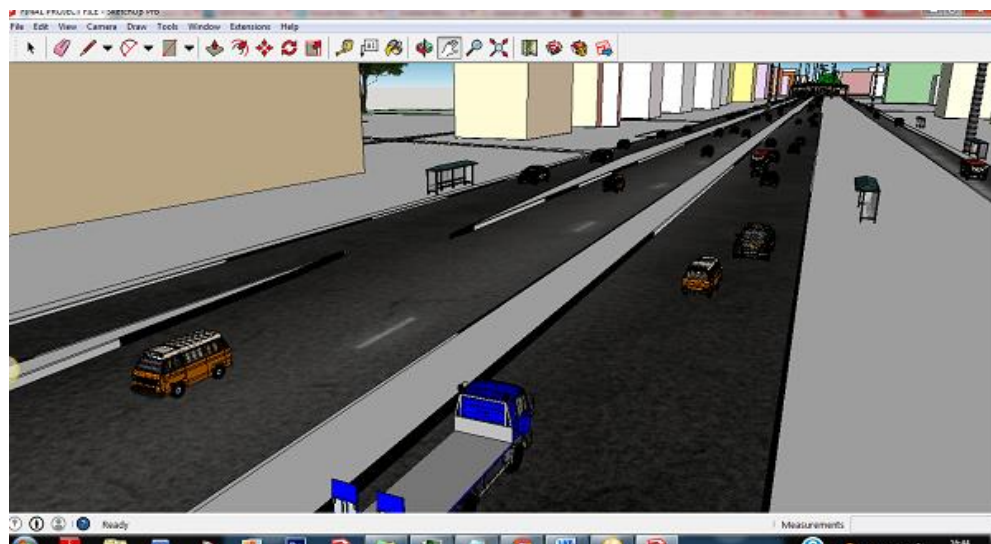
Road Intersection along the Corridor on Ikorodu Road
